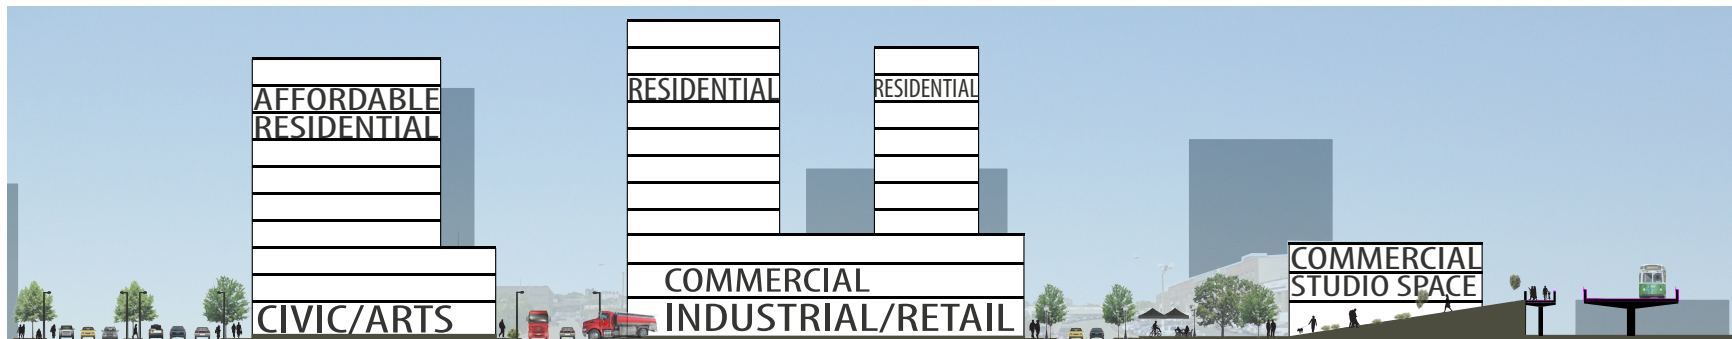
Section down Poplar Street, showing how uses could be distributed with new building heights
